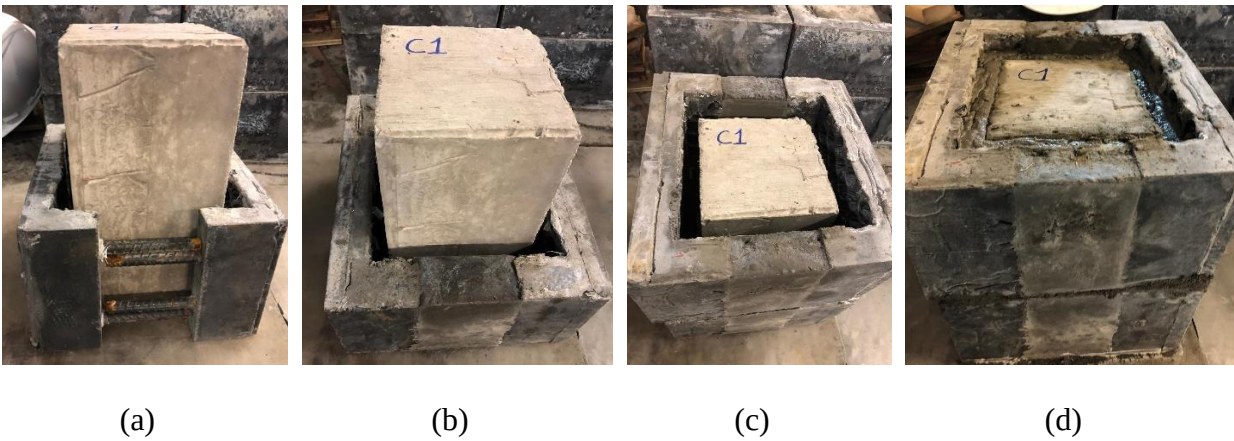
Retrofitted Columns with Precast UHPFRC Jackets and Lap Splice Connection (a) prior to pouring the UHPFRC 3%, (b) & (c) prior to pouring the non-shrink grout, and (c) the final specimens before painting.
